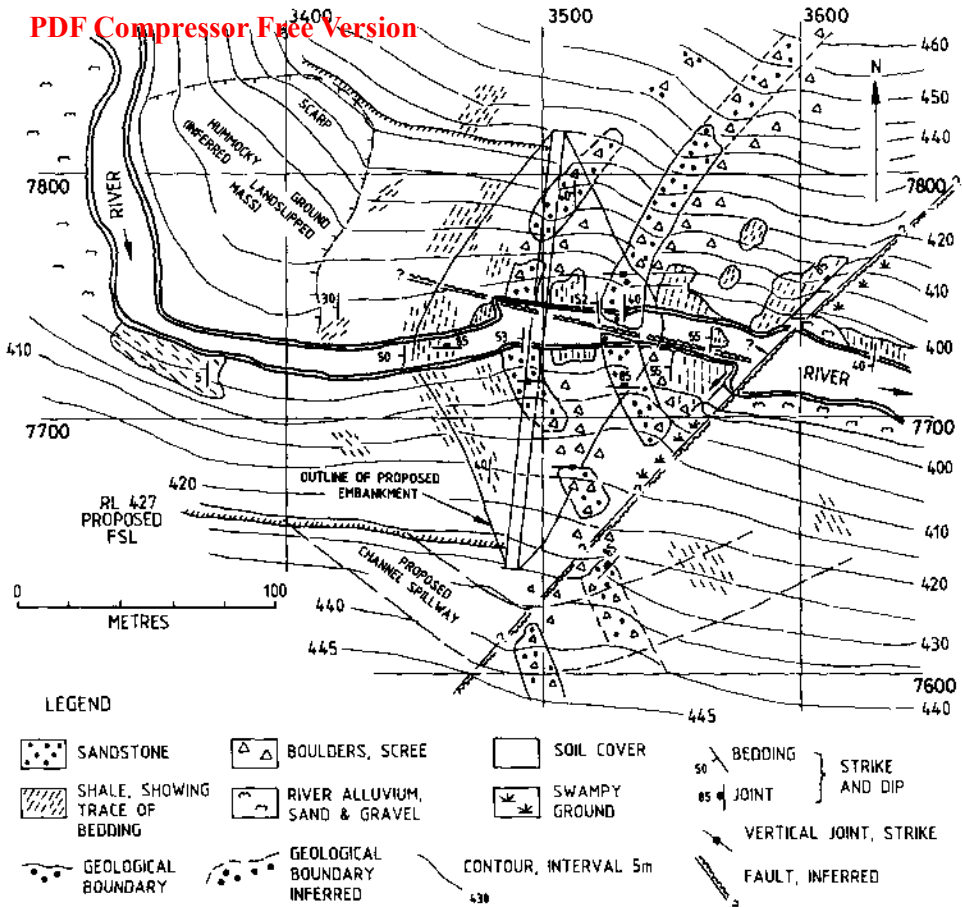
Plan showing some of the features presented on a large scale geotechnical plan of a site for an embankment dam.
